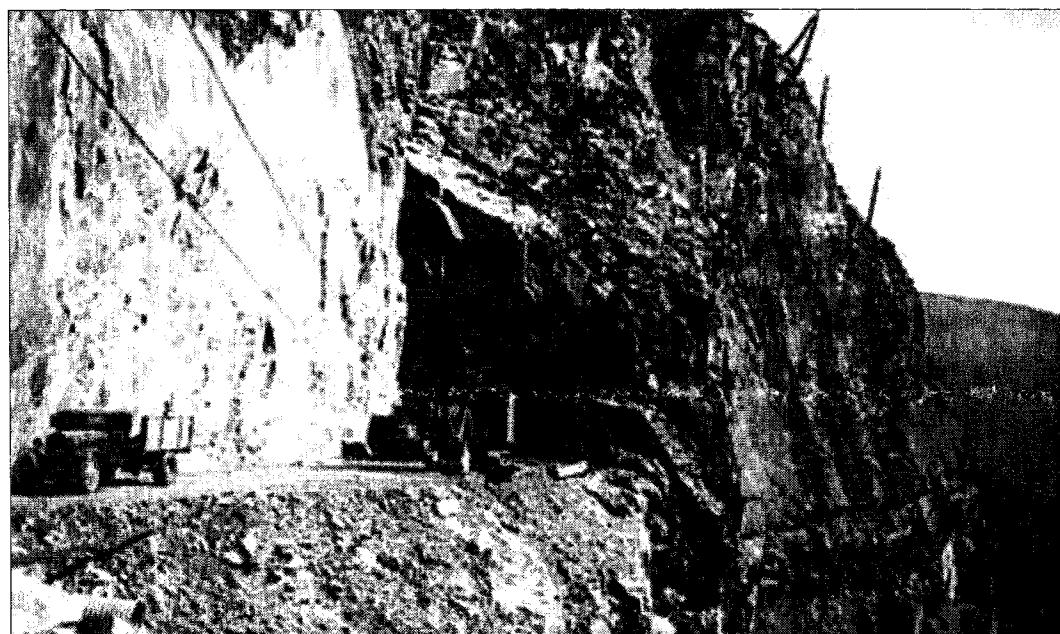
Historic photo showing Stevens Canyon Tunnel under construction, c.1938 (MORA Archive).
